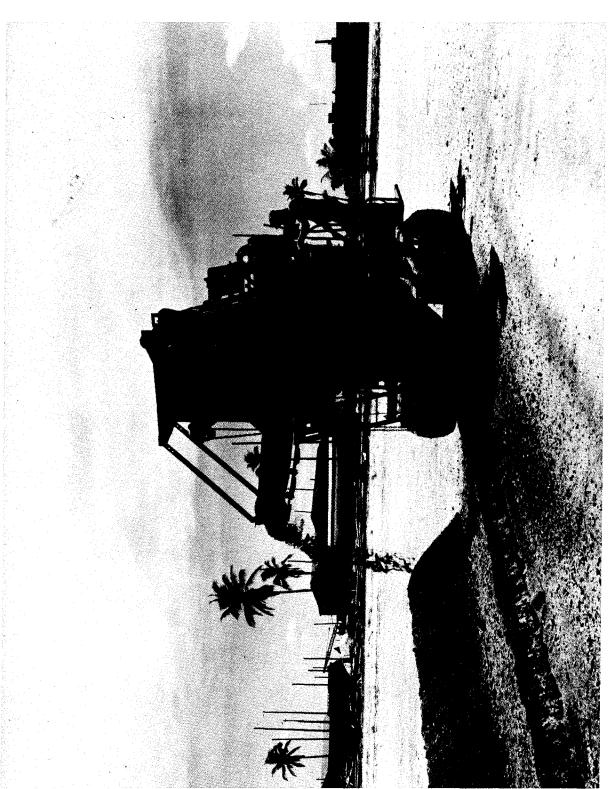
Trenching for New Main Route Cables, Eniwetok Island
